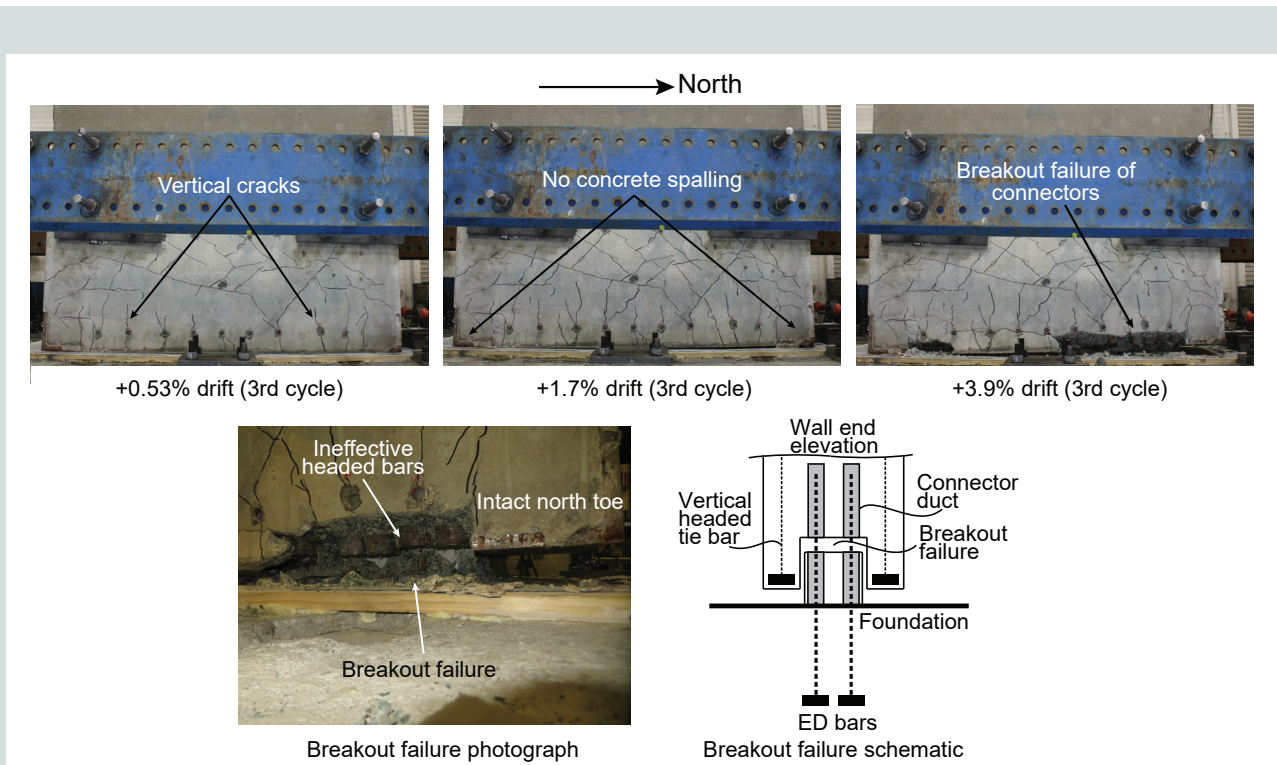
Damage and failure in specimen 1. Note: ED = energy-dissipation.
